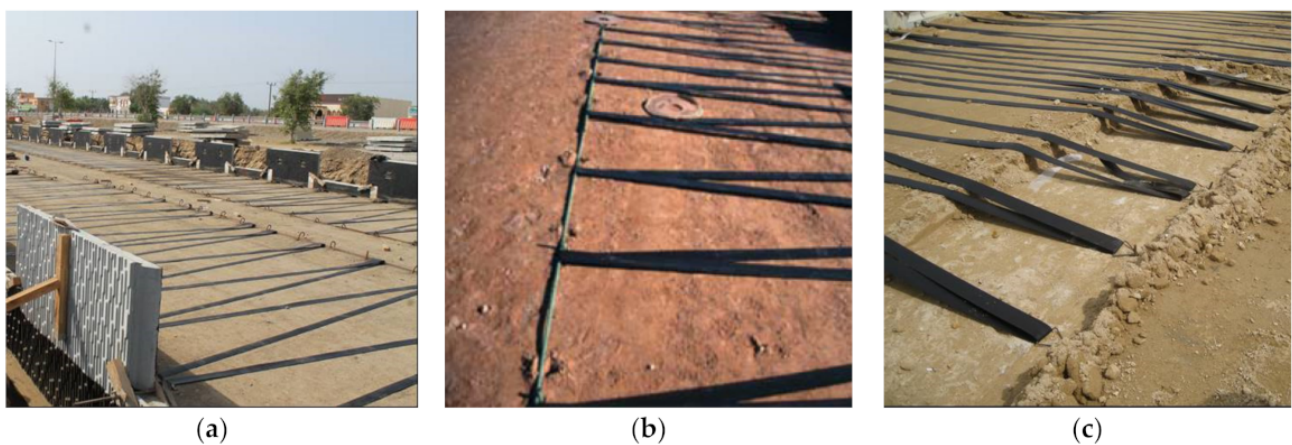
On-site polymeric strip installation examples: (a) back-to-back wall case, (b) longitudinal bar back anchorage and pegs, and (c) trench and triangle anchorage. (Photographs courtesy of VSL Construction Systems—VSoL[®] Retained Earth System [11]).
